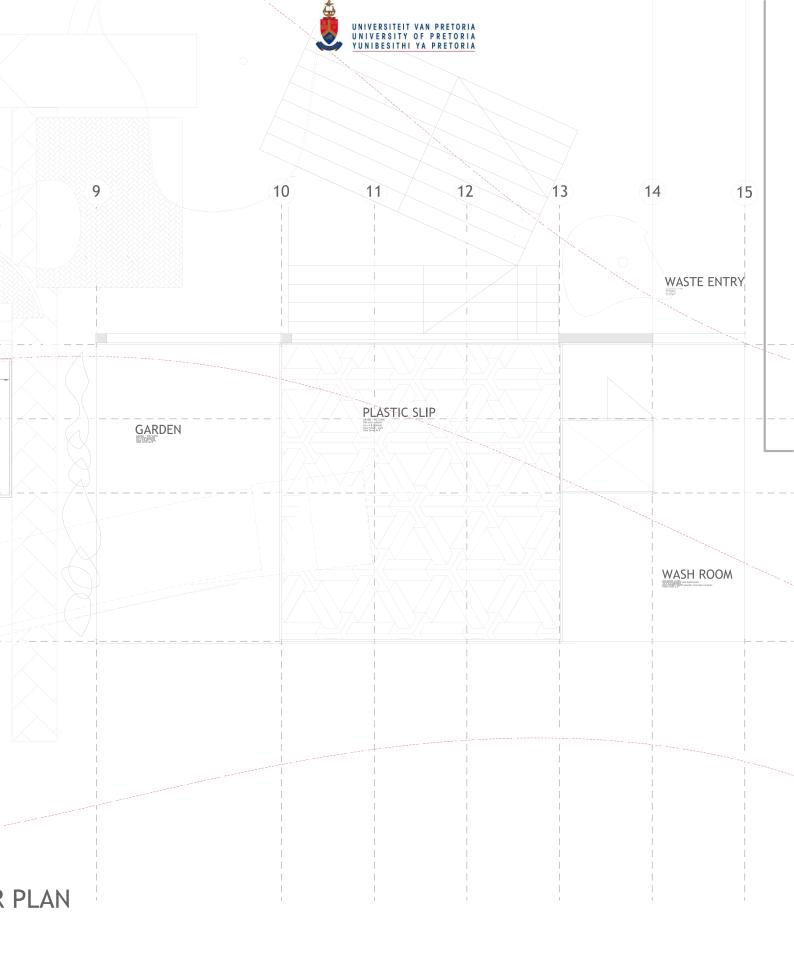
Ground floor sketch plan overlayed with gallery curve overhead.
